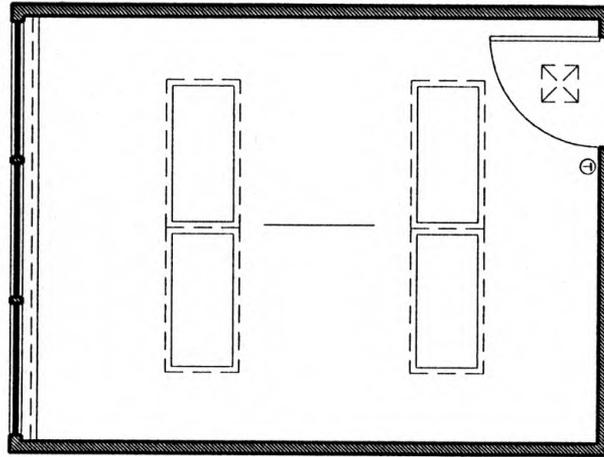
Plan of Skilled Care Work Area - Site 1.
